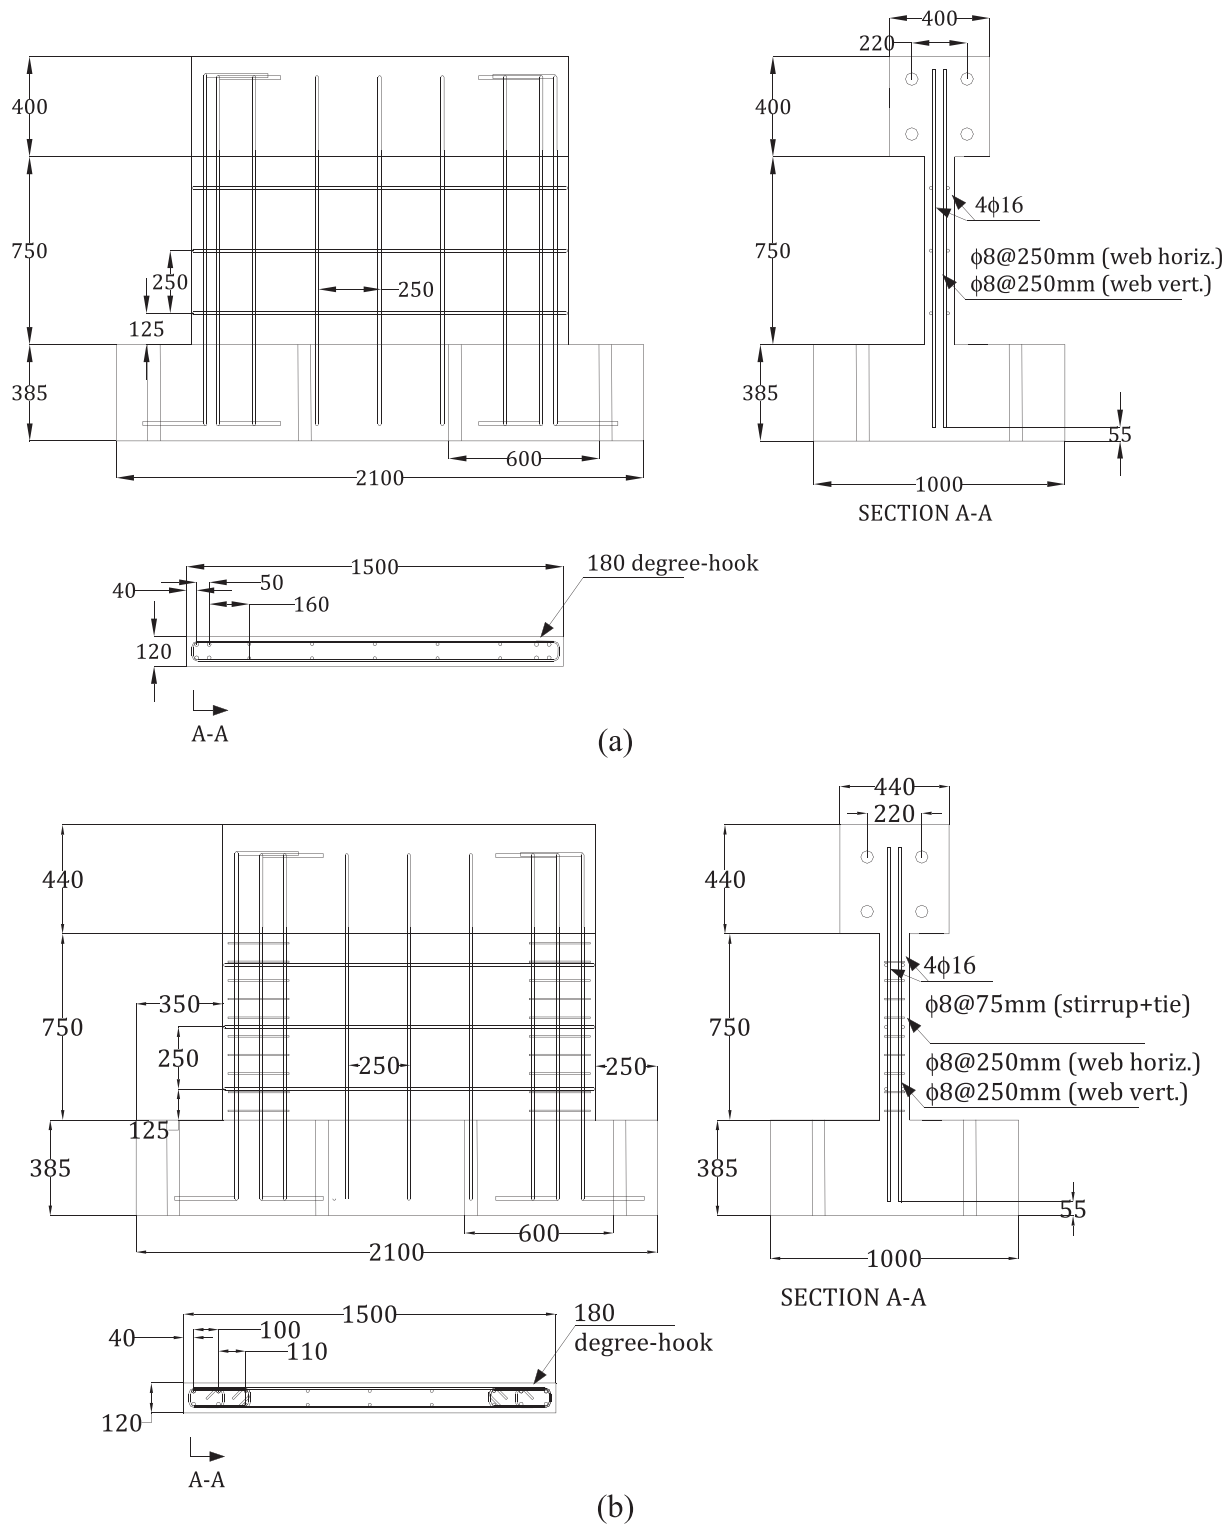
Wall geometry and reinforcement: (a) Type 1 specimen and (b) Type 2 specimen. Note: All units are in mm. 1 mm = 0.0394 in.
